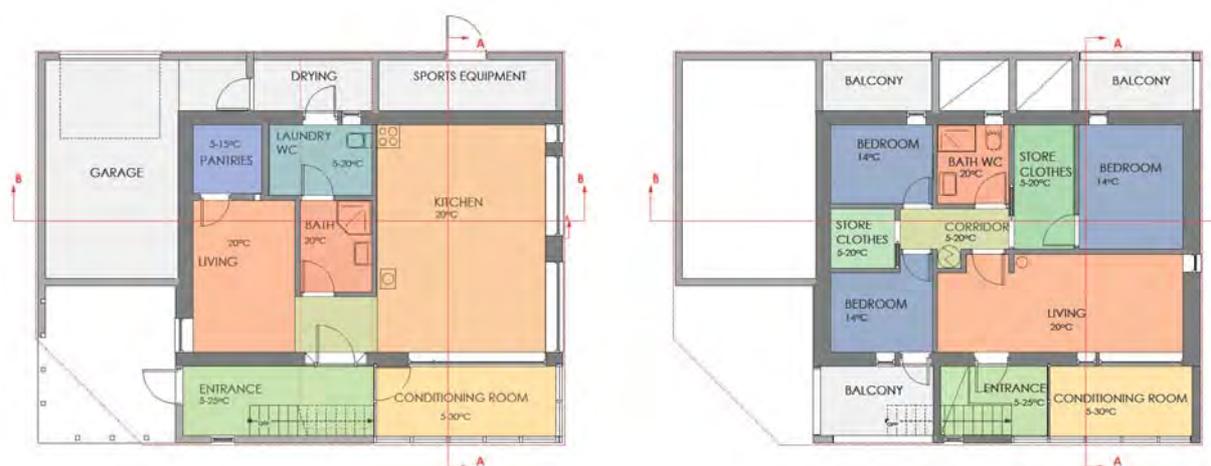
Building model for Bergen locality with ground floor (left) and plan 1<sup>st</sup> floor (right). Temperature levels differentiated by functions. Reduced exposed outer surface in heated rooms. Heated room (see Appendix 3) facing south. Main WC as a separate room. Unheated rooms used as a shield against dominant winter winds from northwest. Living rooms in both floors with glass area more than 25% of the floor area.
